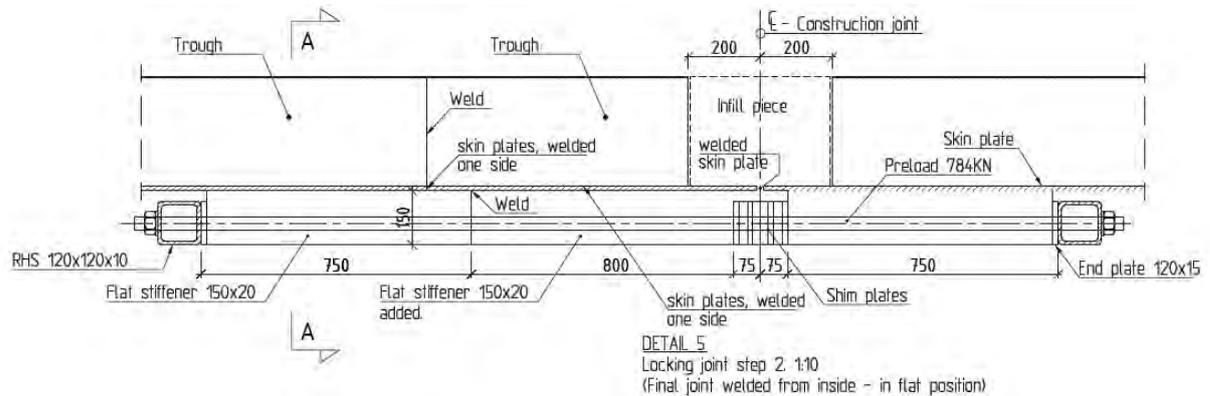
Locking joint for web- and bottom plates, construction joint 3 inclusive 800mm infill piece, longitudinal section Infill skin and stiffener plates now welded into position
